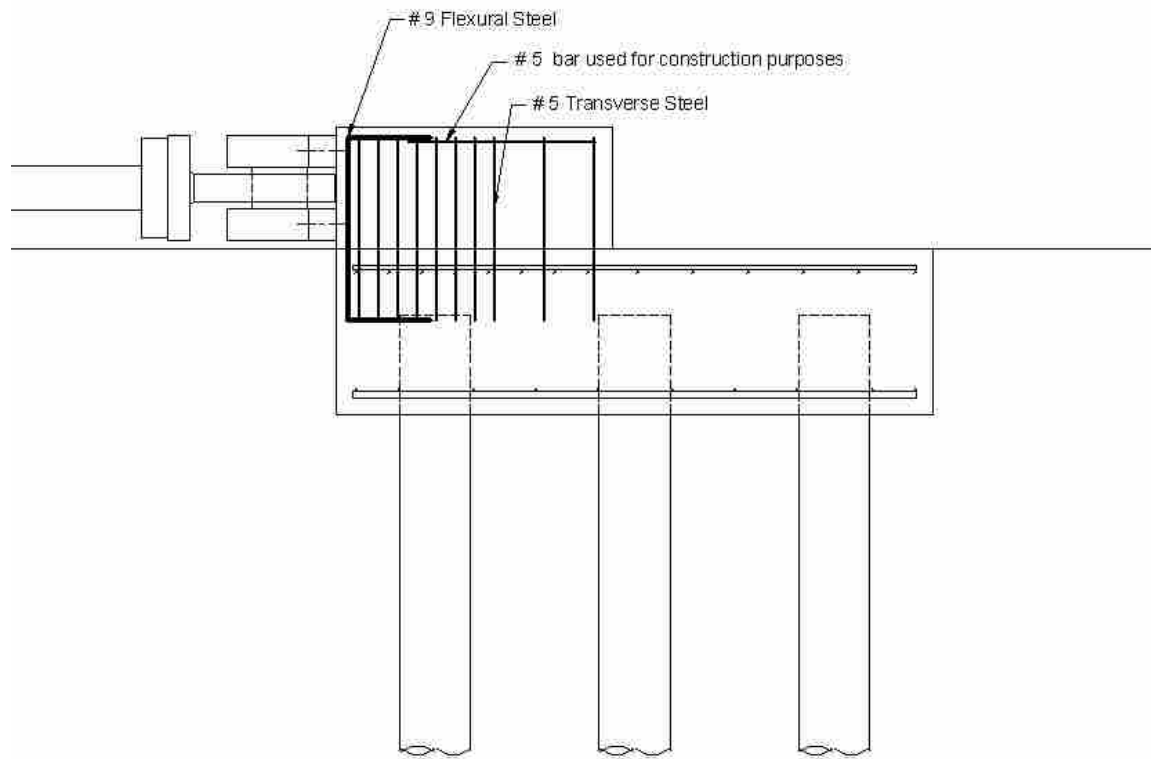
Corbel steel layout for caps 1 and 4.
